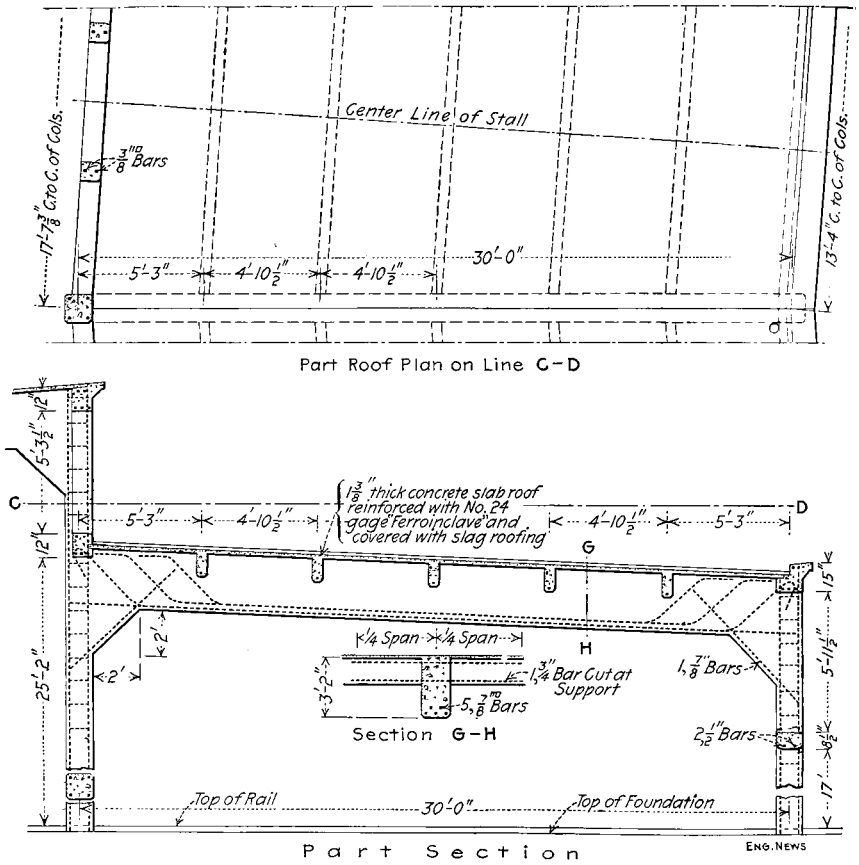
DETAILS OF MAIN GIRDER ENGINE HOUSE.
